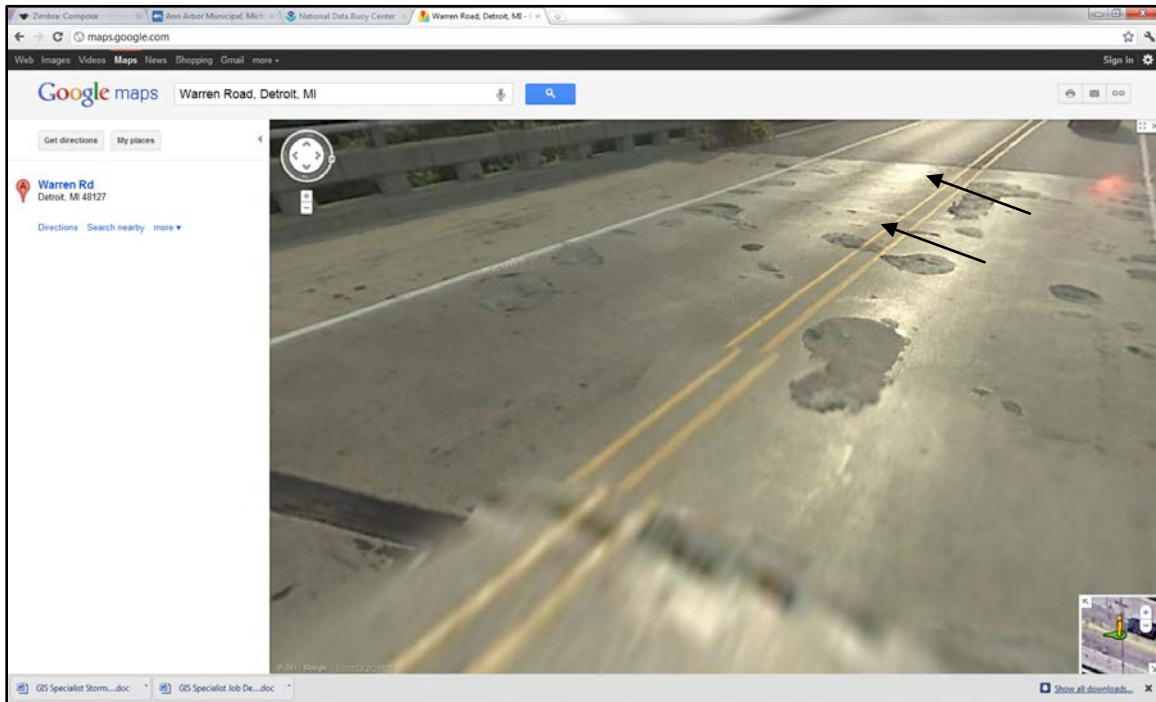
Street View image of the western-most span of the Warren Road bridge showing patches on the bridge deck.
